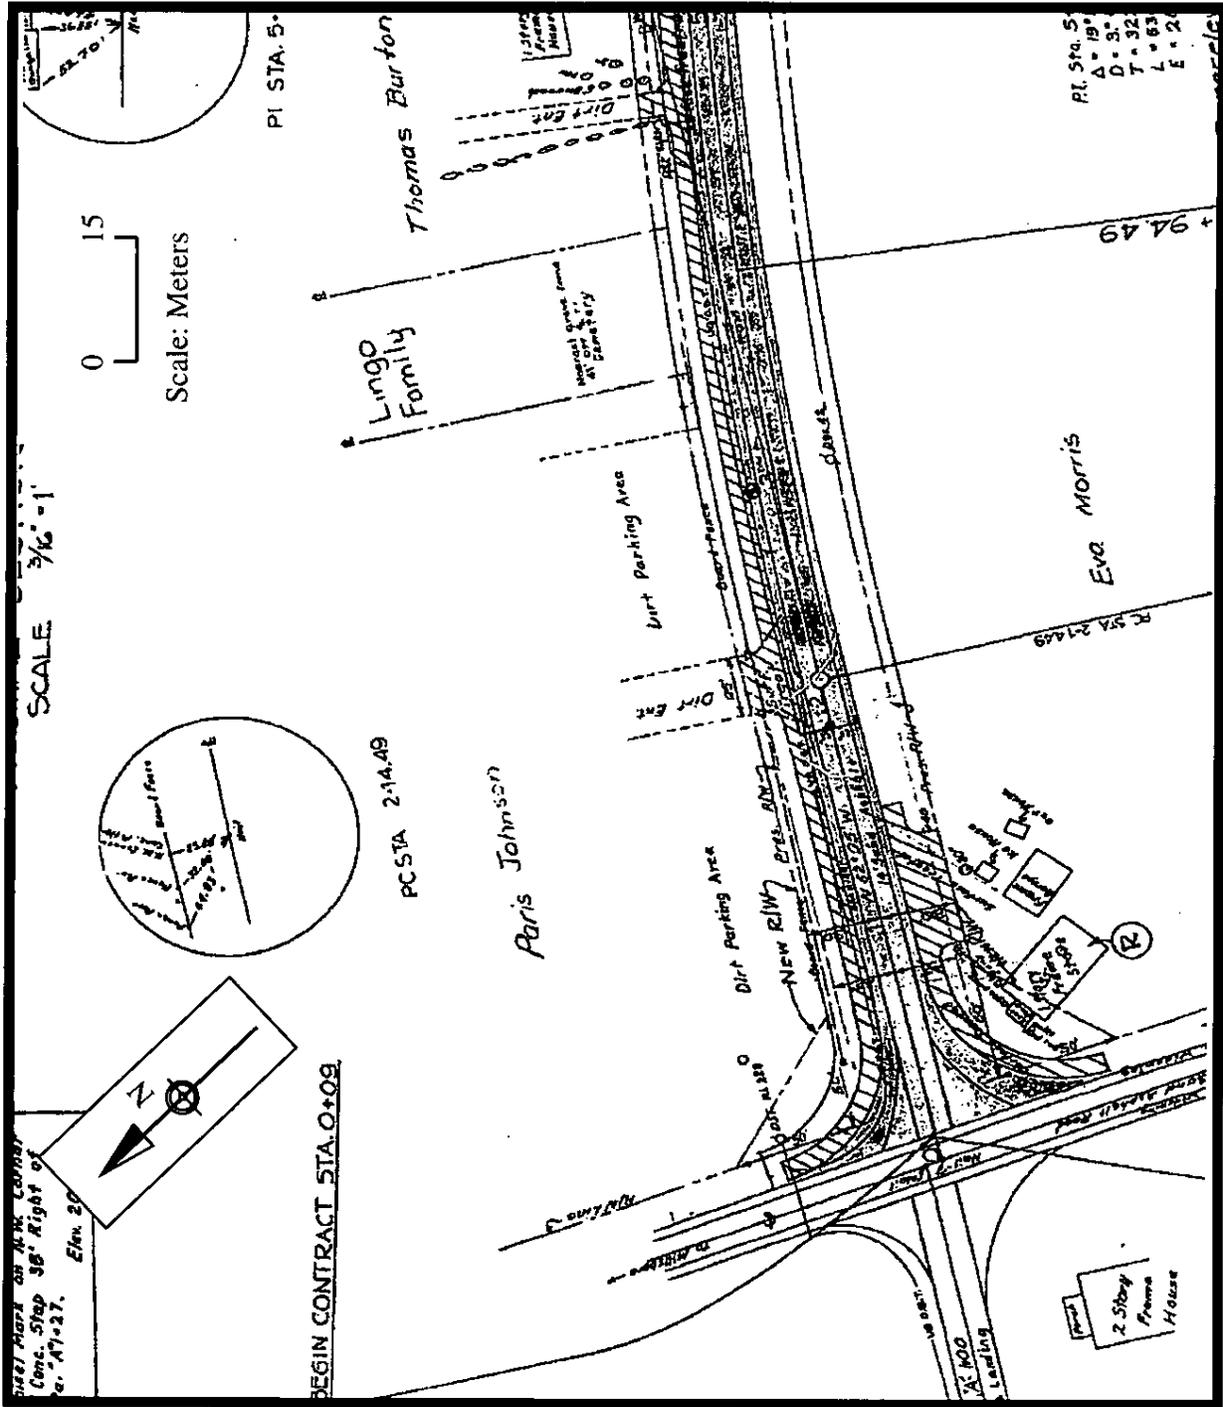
As Builts of State Road 24/ State Road 5 Intersection in 1965 (Source: Delaware State Highway Department 1965).
